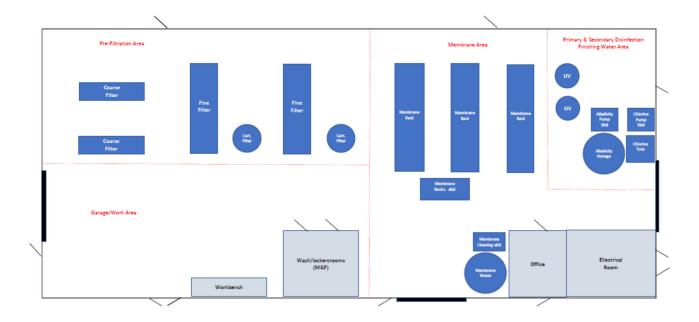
Great Pond Water Treatment Plant Process Layout
